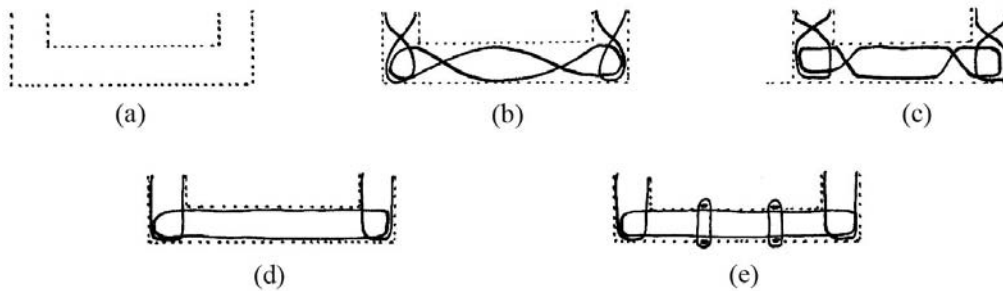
Different tyre strap plan configurations that have been tested for reversed out-of-plane loads: (a) an unreinforced wall, (b) catenaries, (c) modified catenaries to aid construction and (d) simple wrapping around wall elements. In (e), the recommended option, horizontal straps wrap the walls and are tied through and to vertical straps with 2 mm dia. wire or equivalent.
